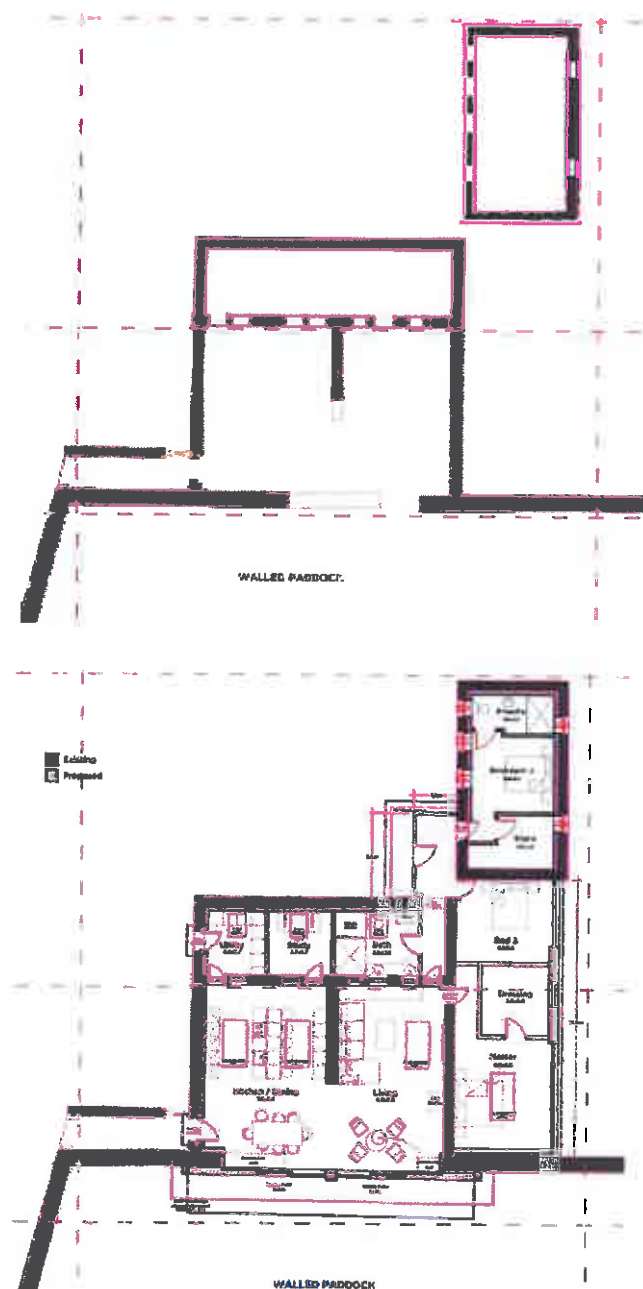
Existing & proposed layout plan extracts (NTS, Source: Peter Hitchen Architects)
